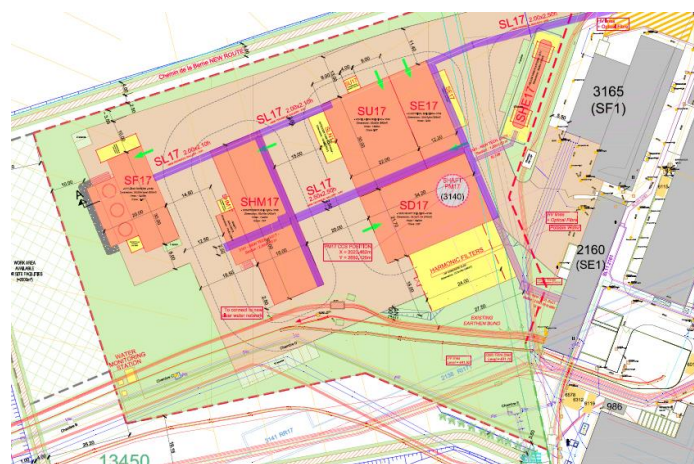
The LHC Point 1 with the new HL-LHC surface buildings in orange. Simple concrete slabs are highlighted in yellow.
